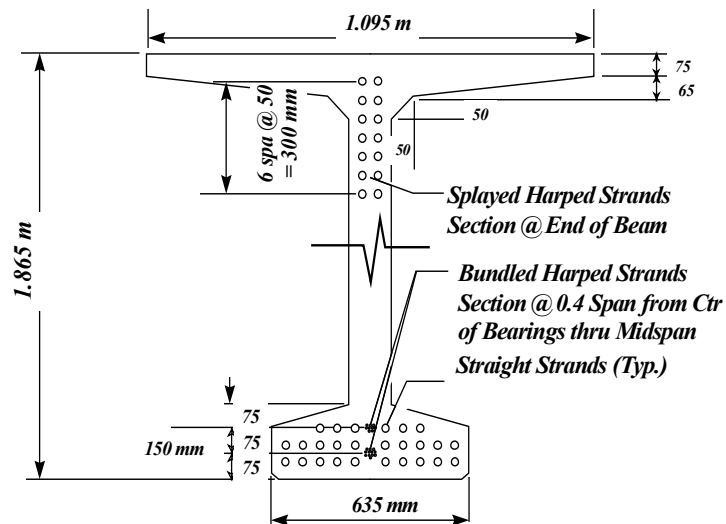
Typical W74MG Prestressed Girder and Strand Pattern
